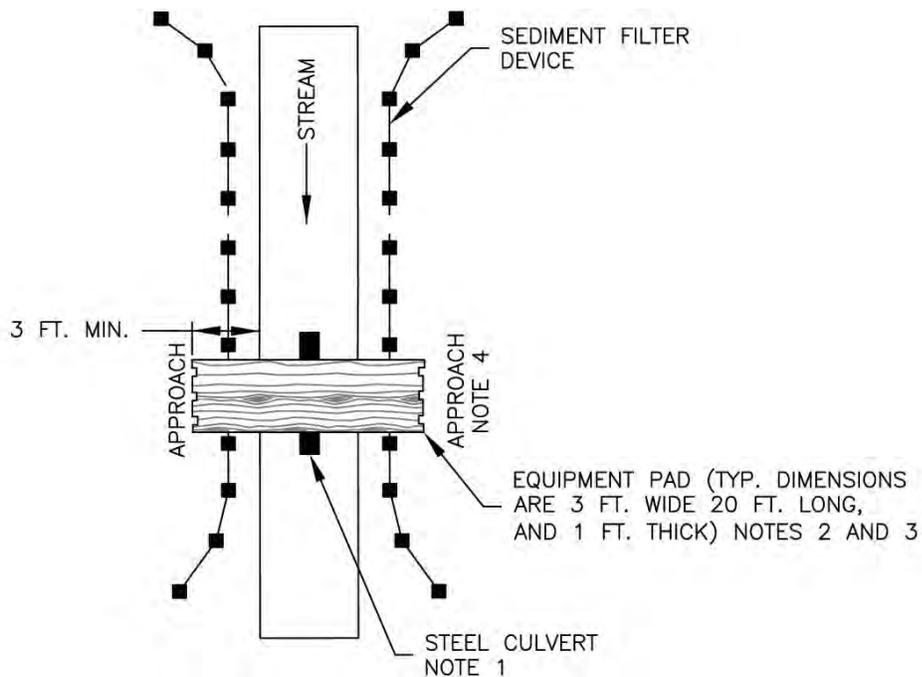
Temporary Equipment Crossing Culvert and Stone
